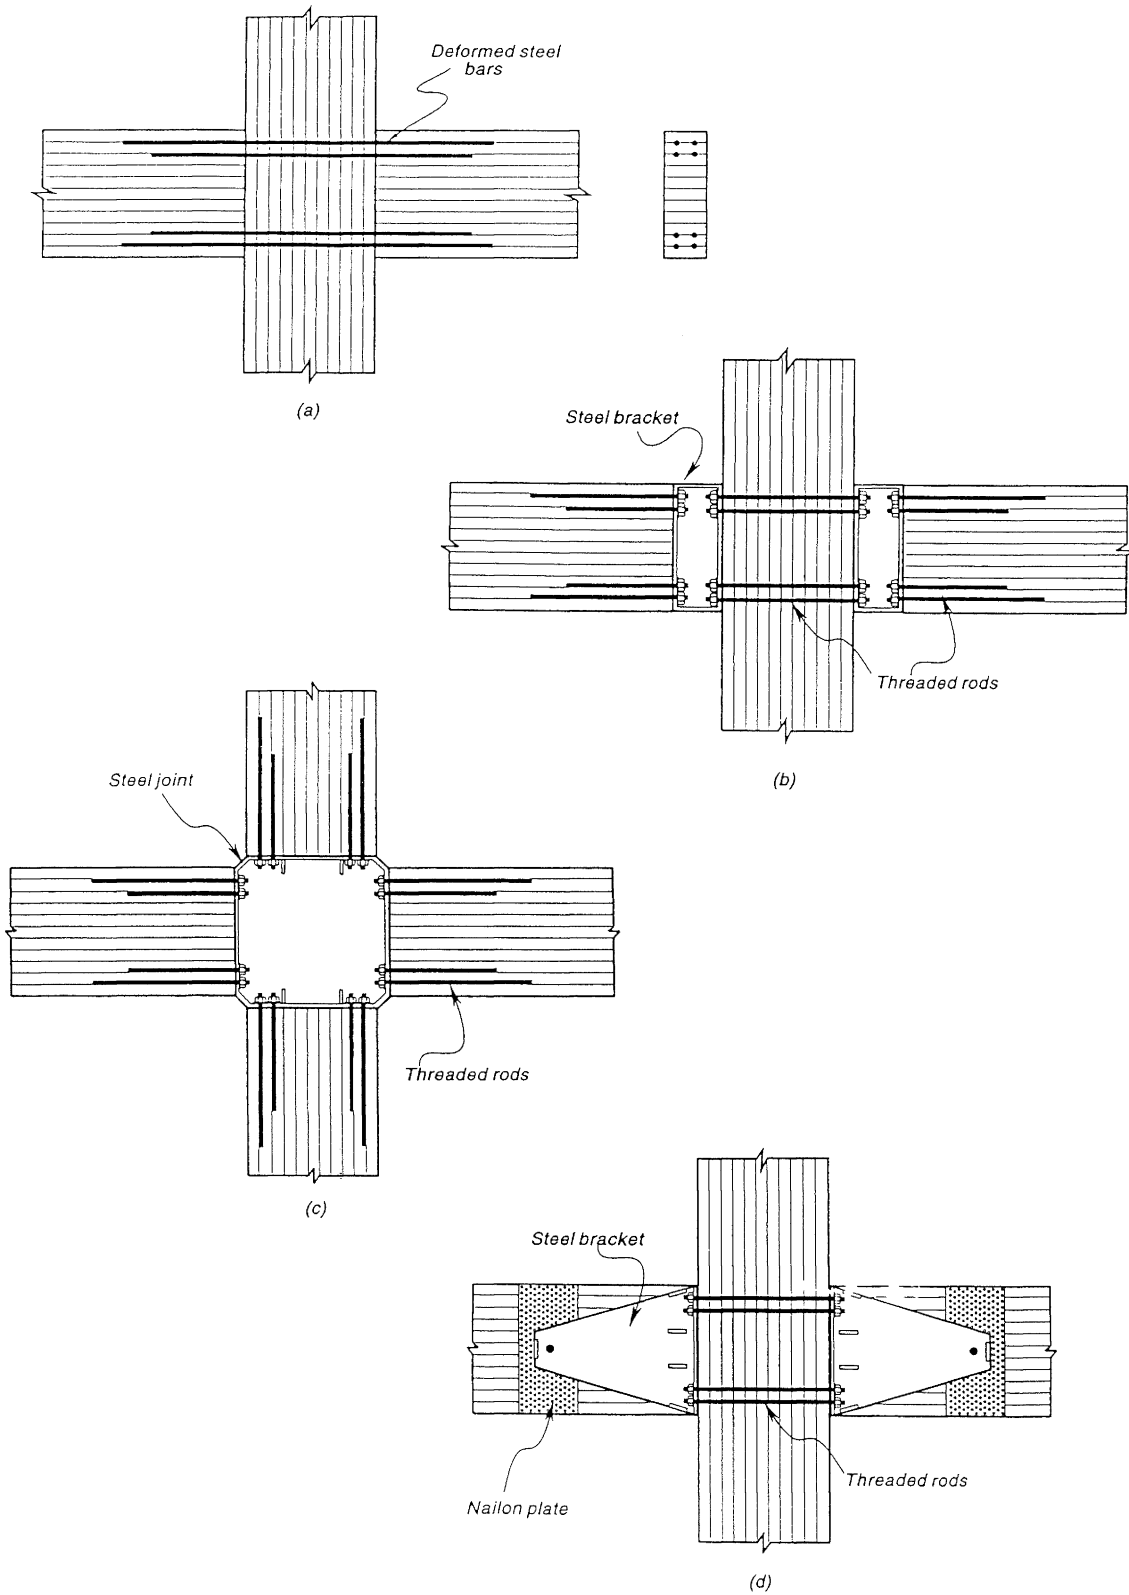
Multi-storey beam-column connections using epoxied steel rods.
